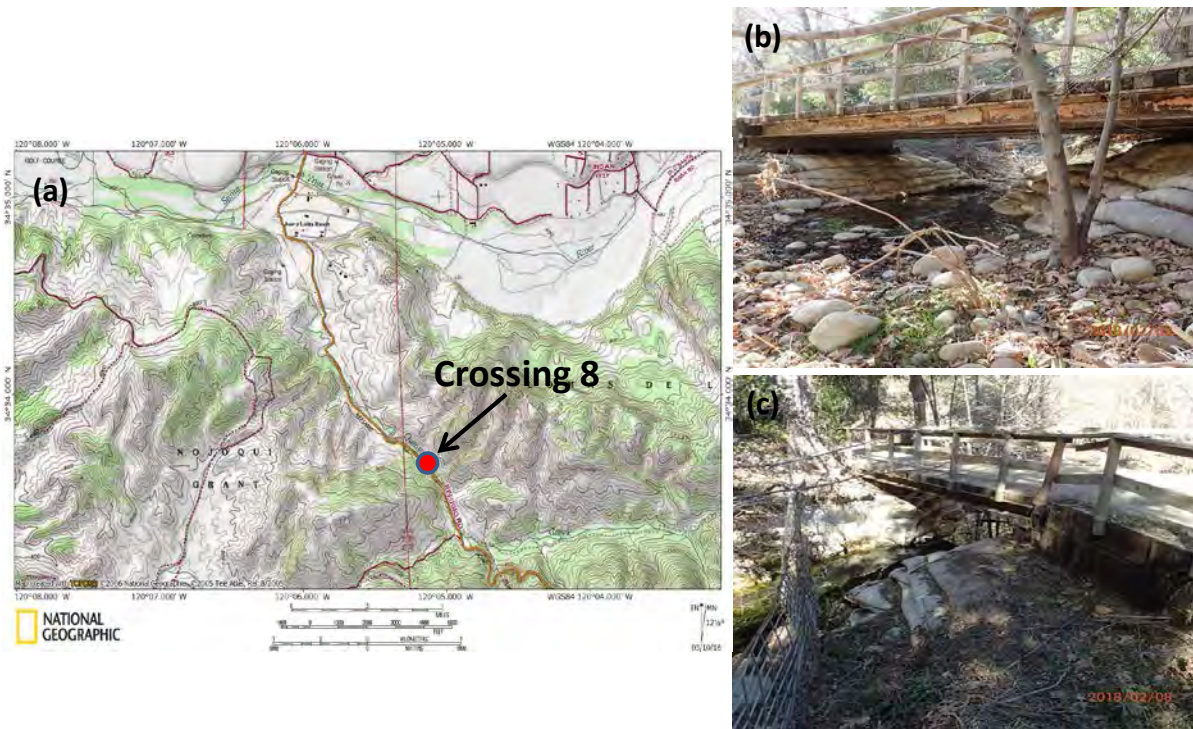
Quiota Creek Crossing 8 (a) project location, (b) view looking upstream under the temporary bridge and (c) view looking north across the temporary bridge on Refugio Road at the impediment.
